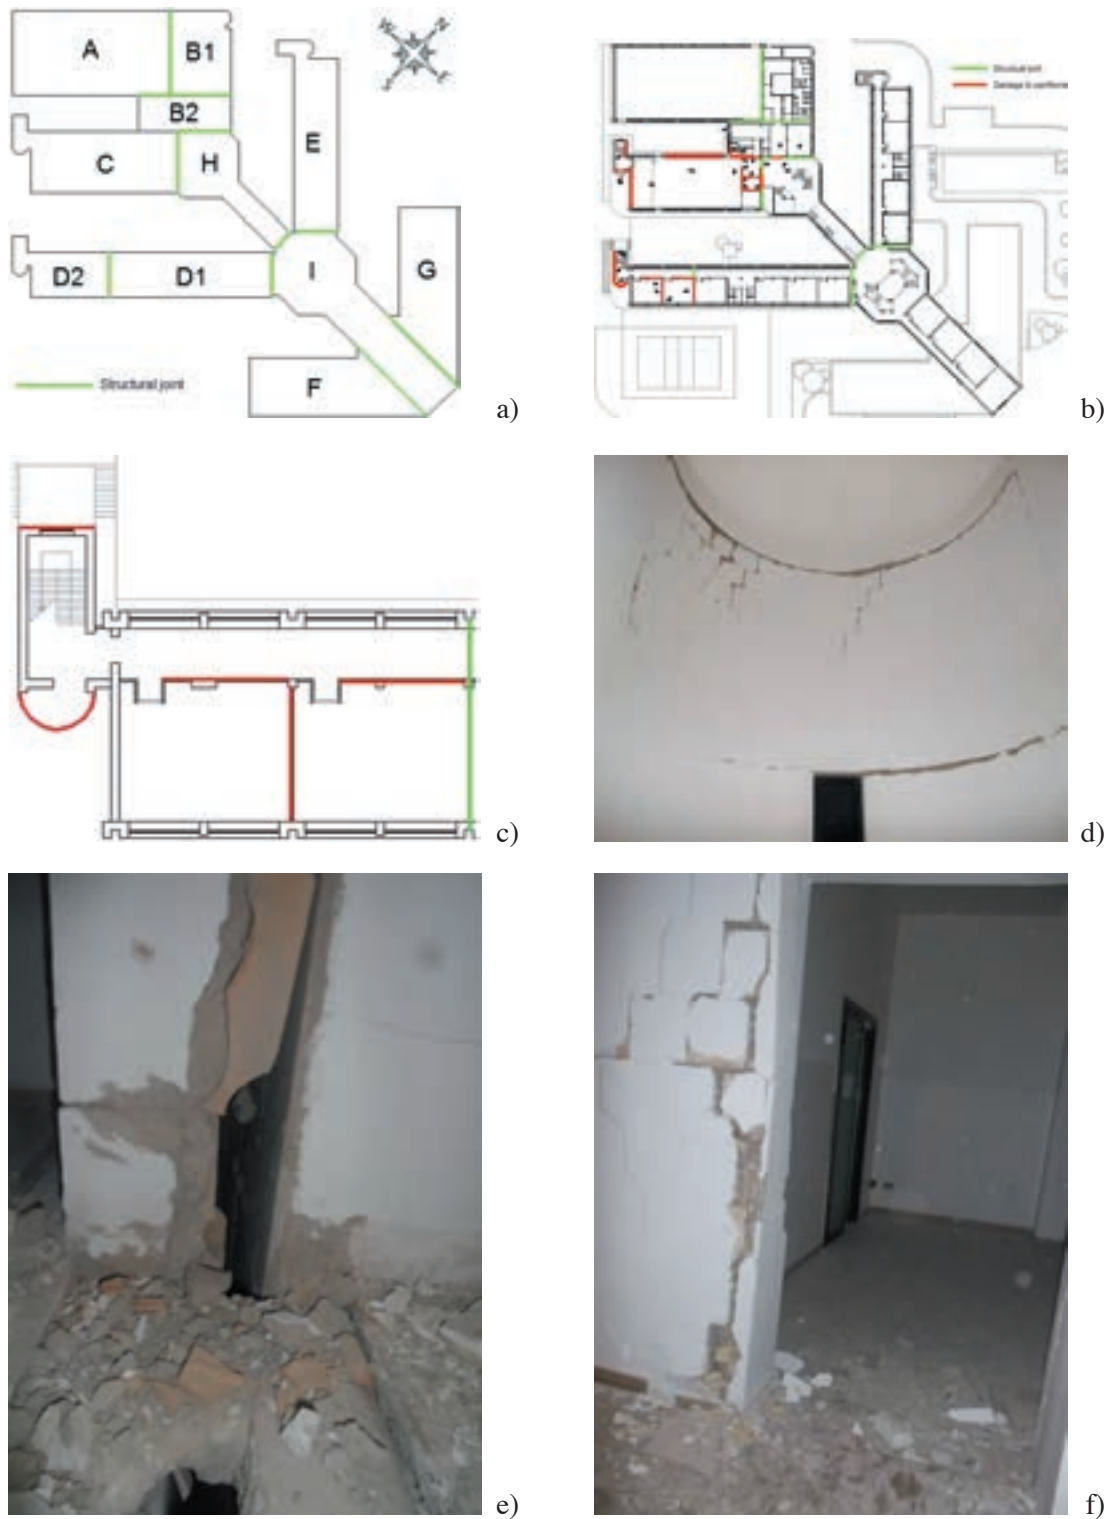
Pascal high school building: a) plan view of the complex and structural joints (green lines); b) location of the most significant damage (red line) in buildings D2, C, H, B2; c) and d) building D2 original project with eccentric damaged stairwell; e) damage to structural joint between buildings B2 and C; f) damage to non-structural masonry infills between buildings B2, C, and H.
